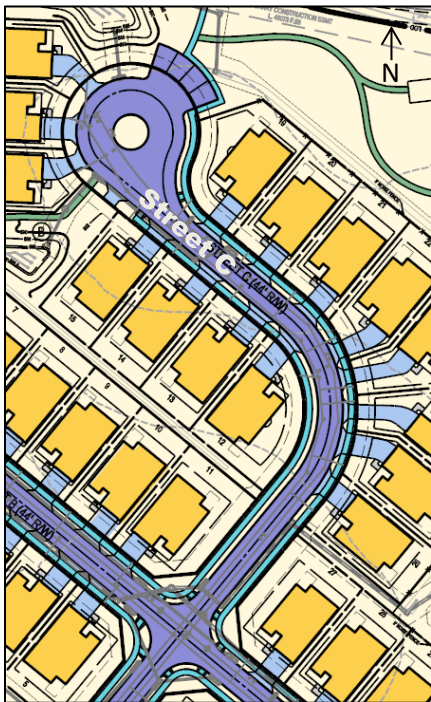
Cul-de-sac bulb at Street C and sidewalks shown in blue.
